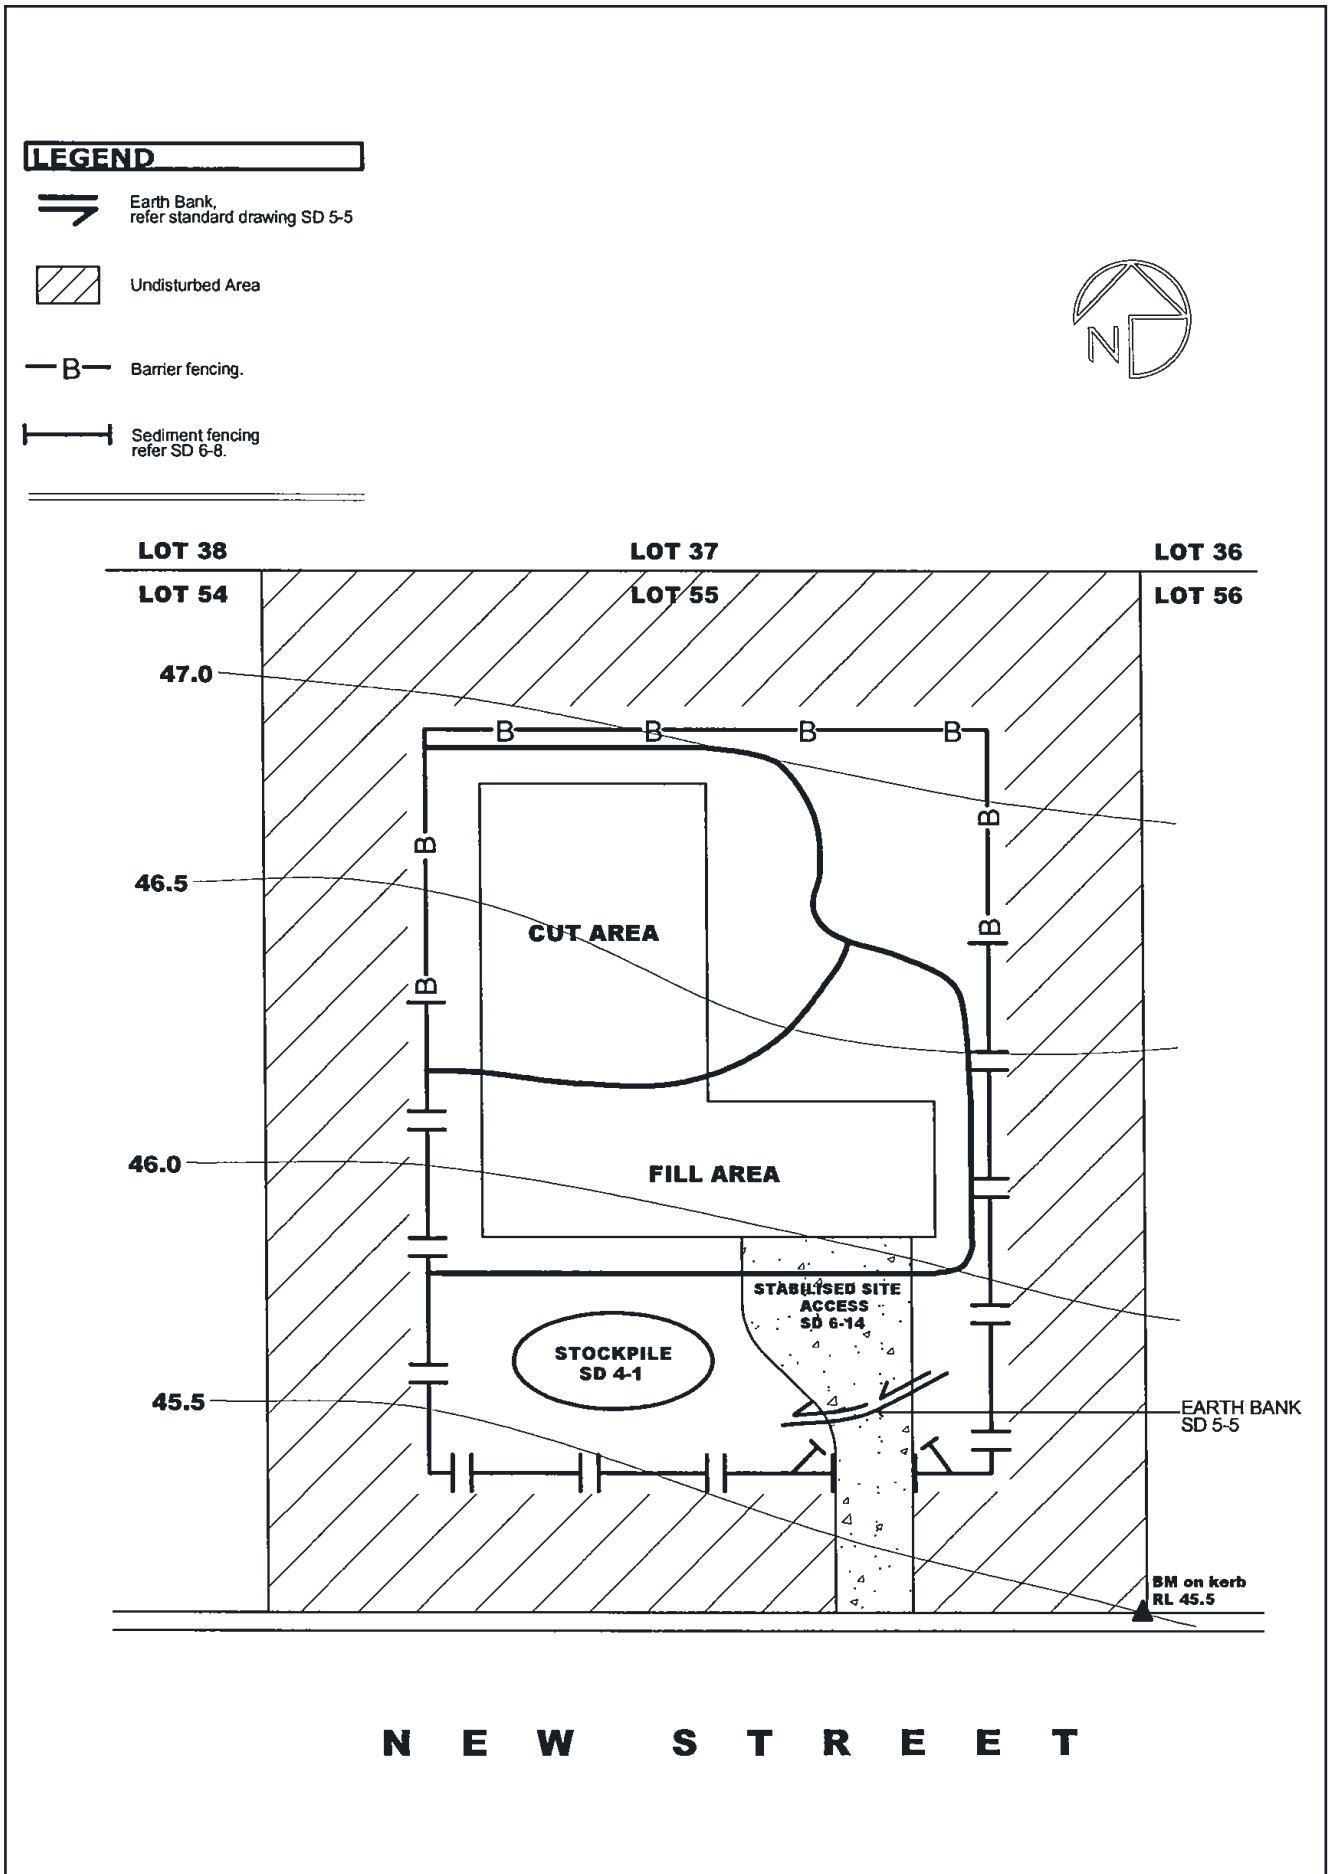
Erosion and sediment control plan for a residential dwelling
